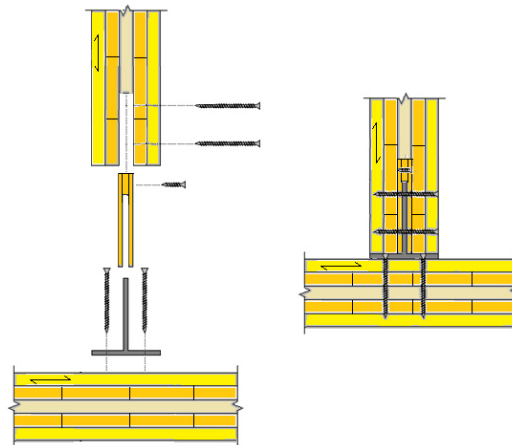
Concealed plate solution for wall-to-floor connection.
